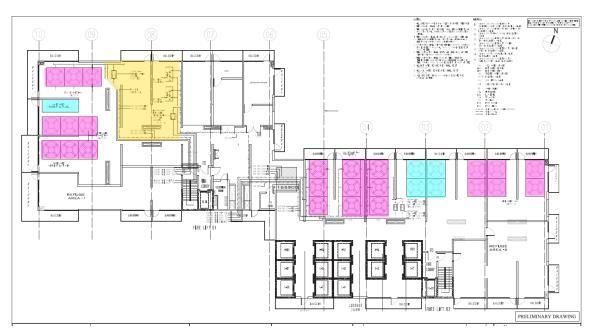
below illustrates the layout plan for a typical WWTP in each of the 5 Zones of the building
